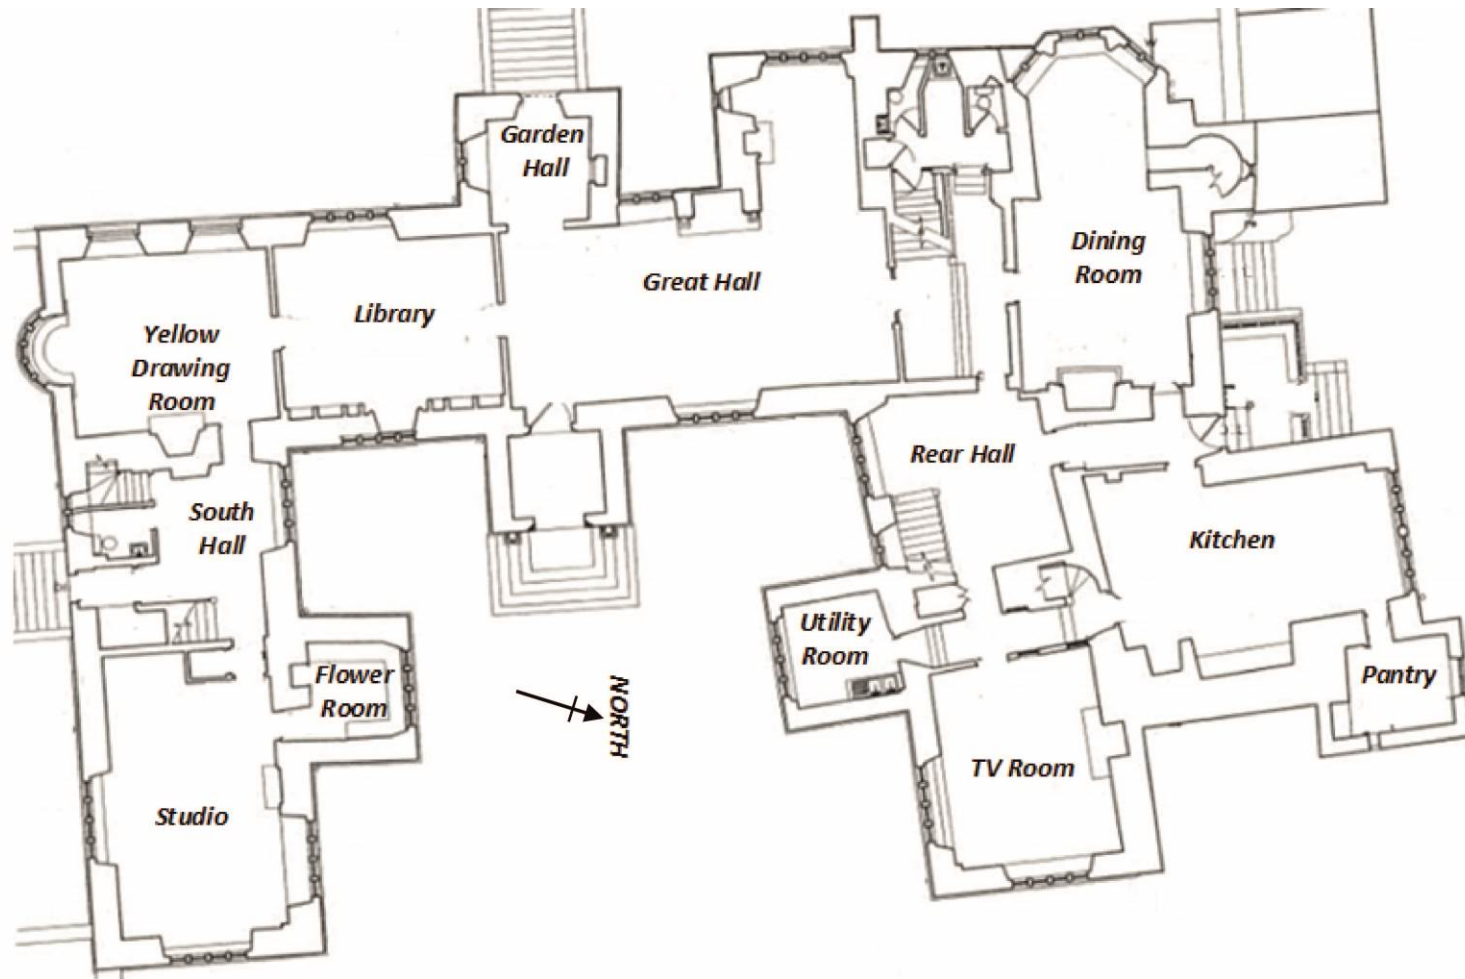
Plan at ground-floor level with named rooms/areas (after Rodney Melville & Partners)
